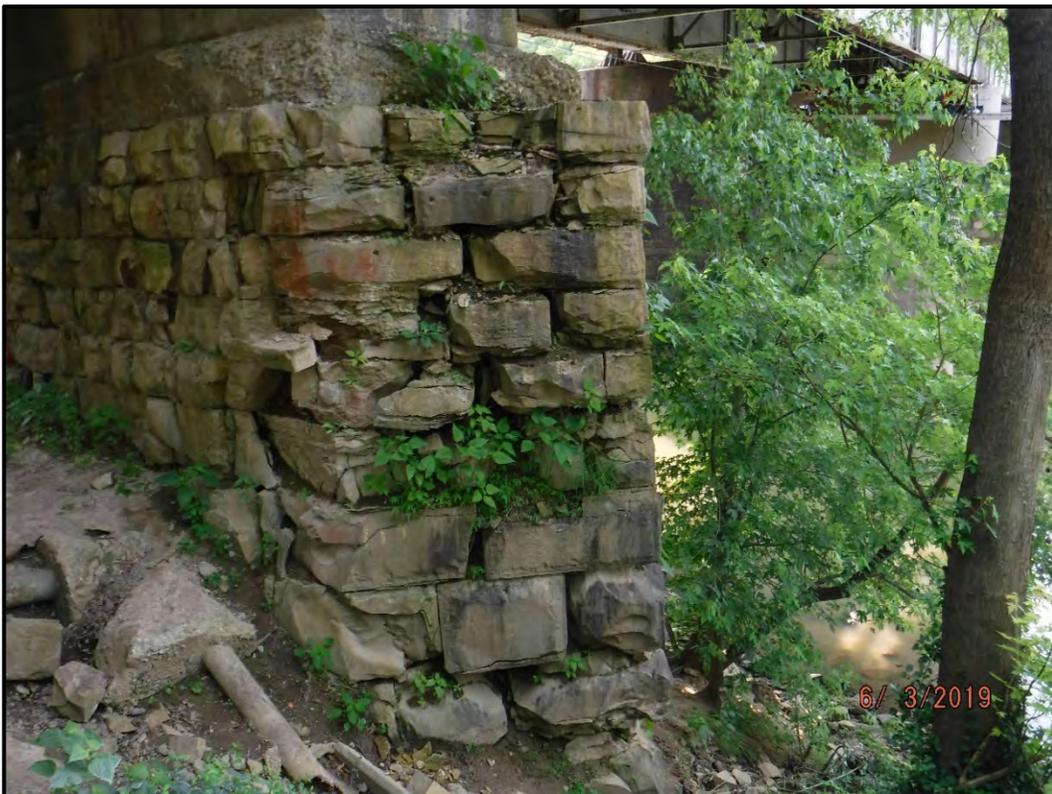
Northeast face of Pier 3. Note the heavy cracking and voids that are 3in wide and up to 2.5ft deep.
